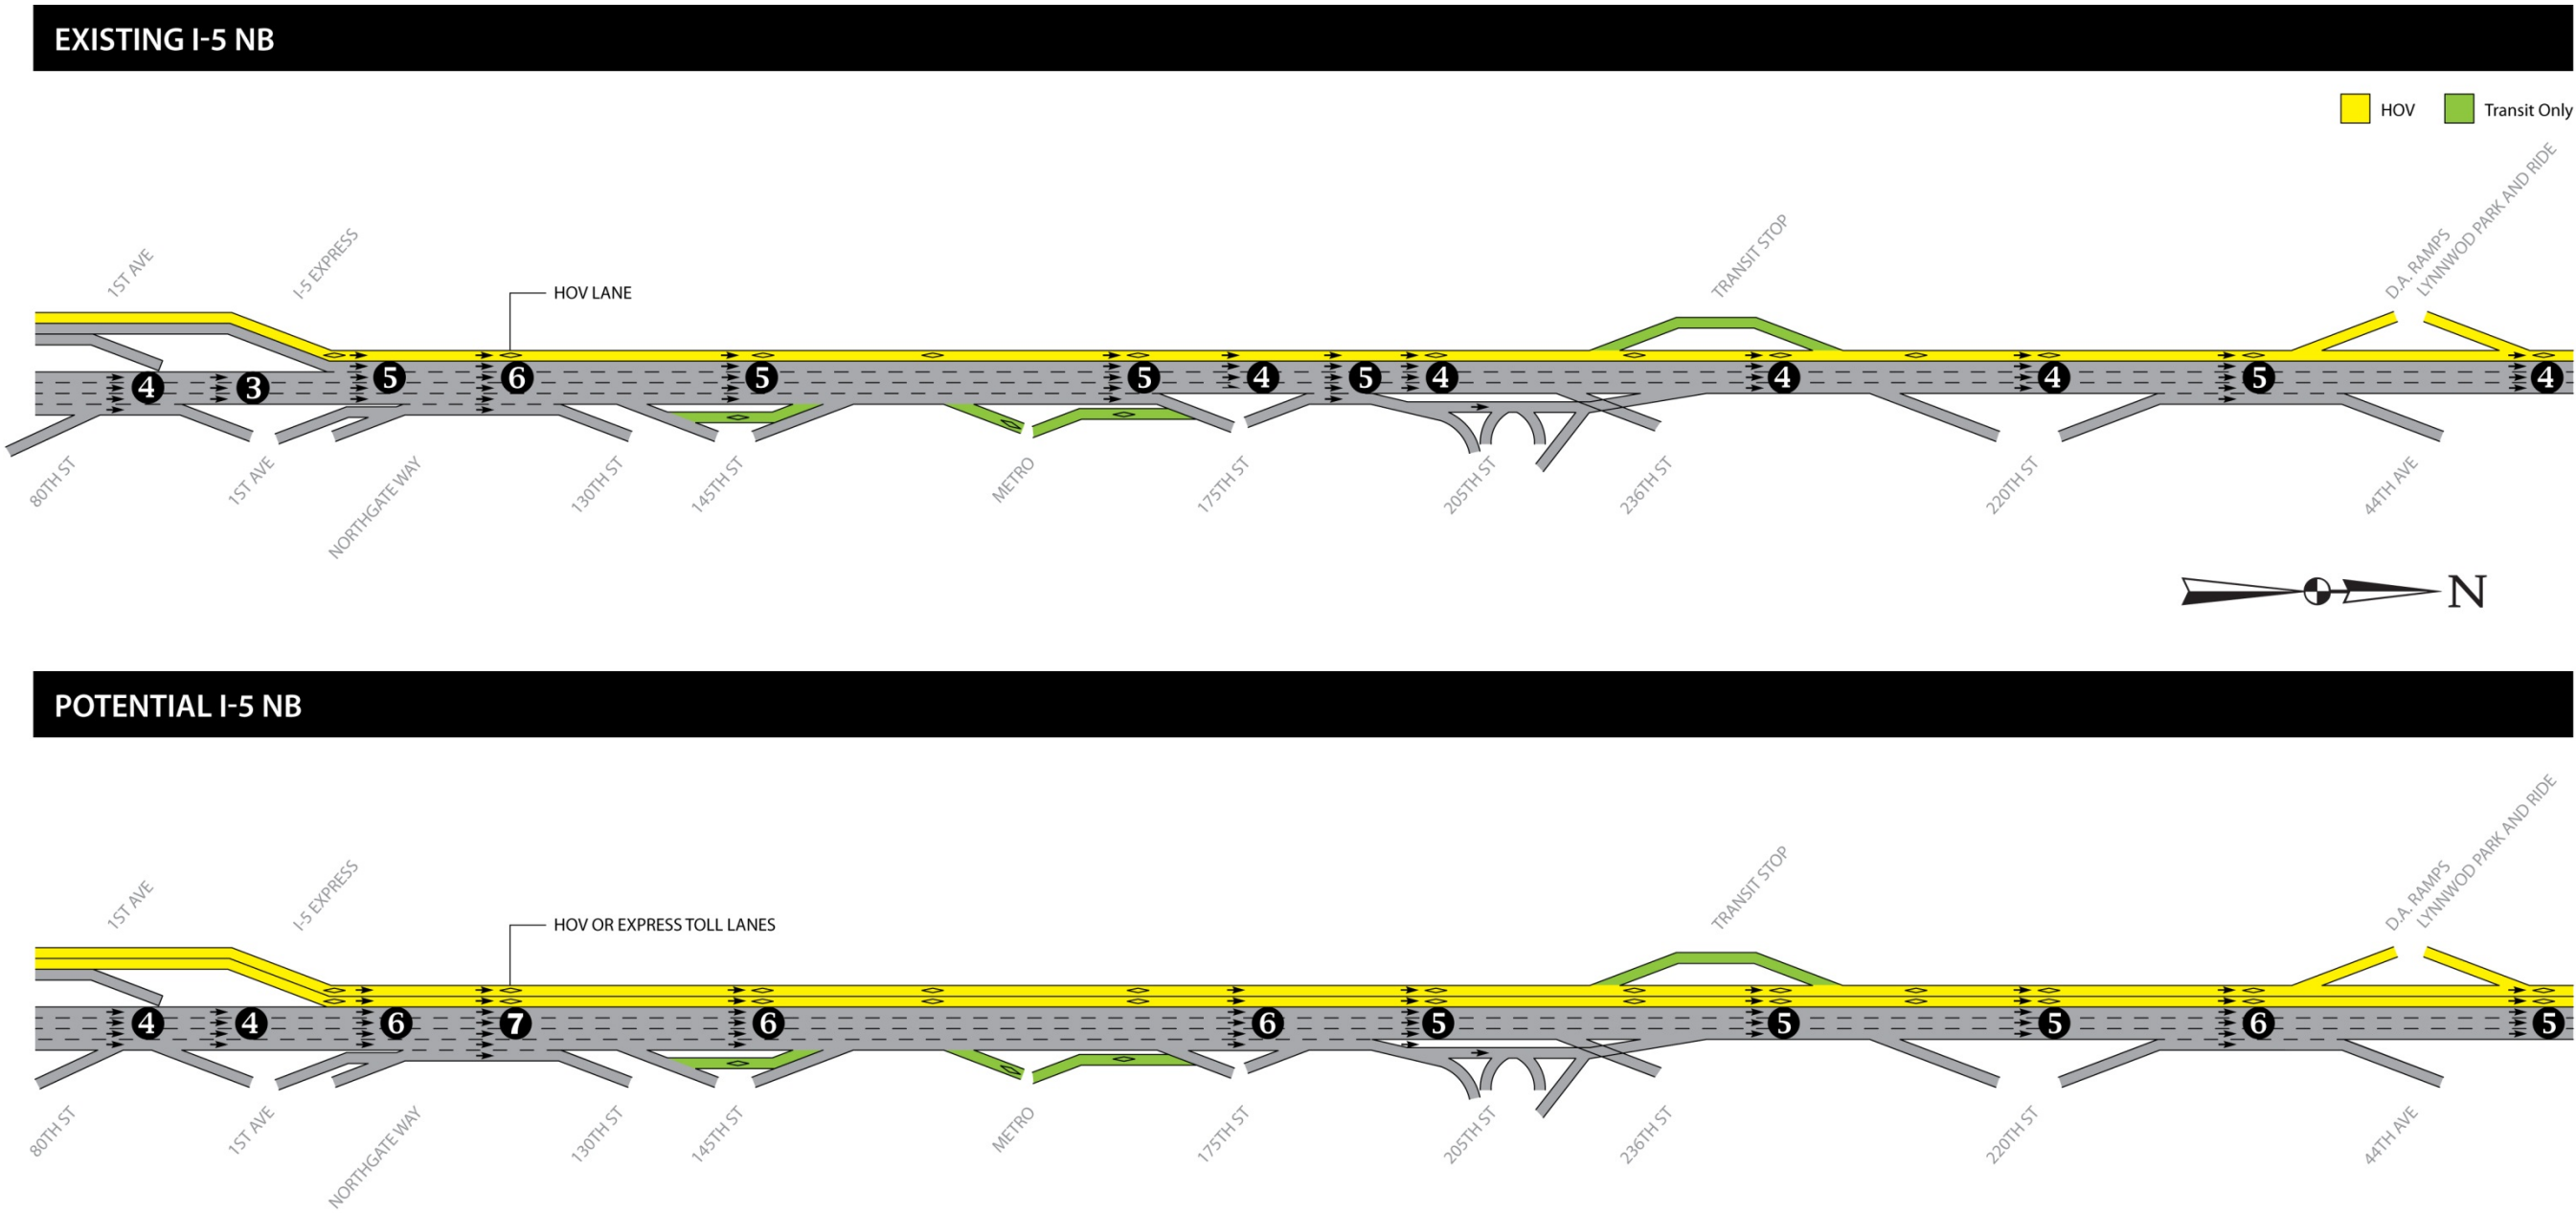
Existing and Potential Future I-5 Northbound Lane Schematics
